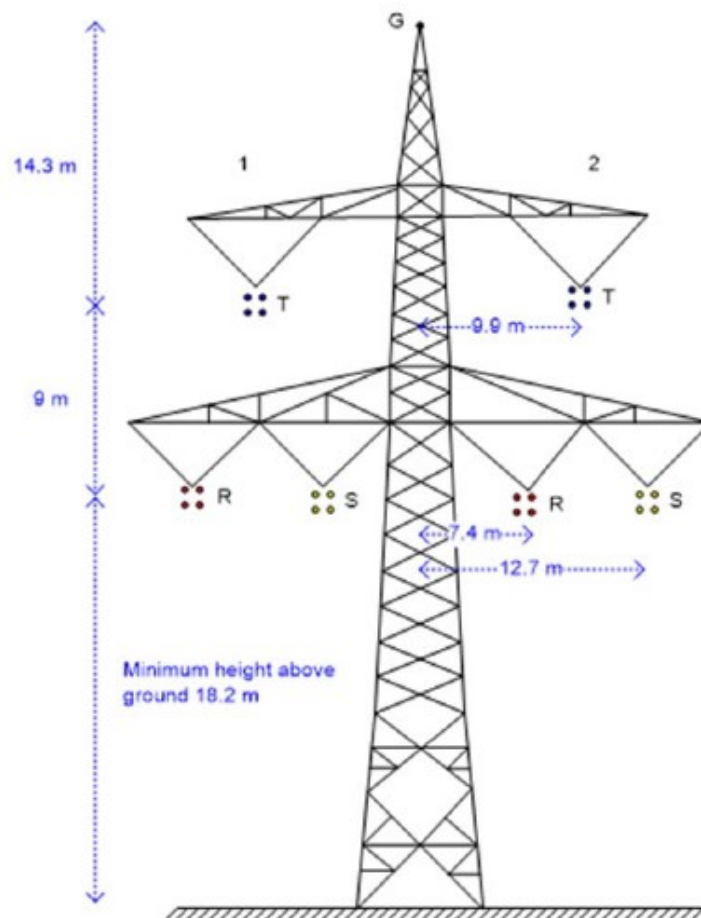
Typical Danube AC 400 kV Tower Setup
